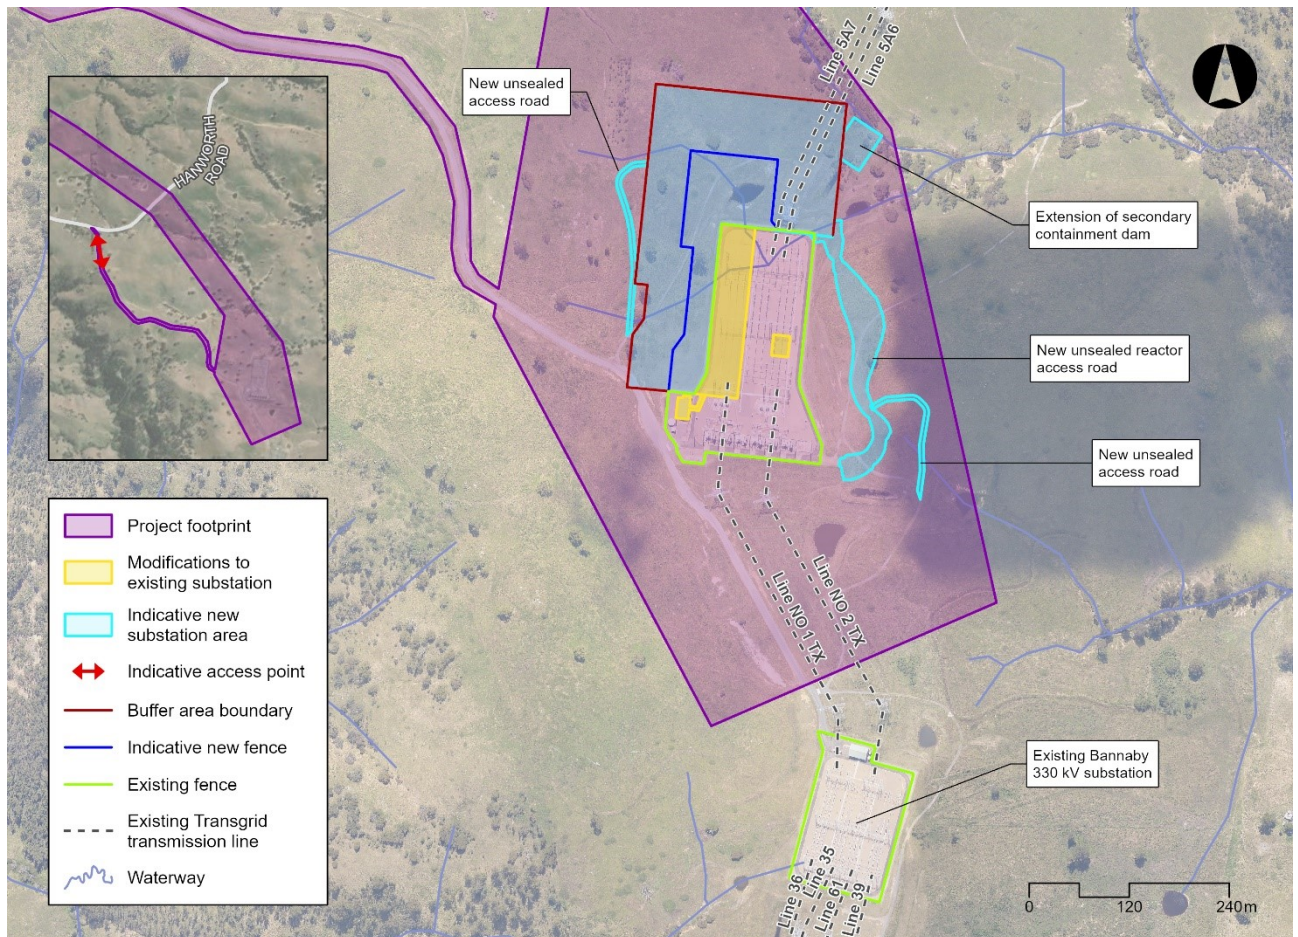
Indicative layout of the modified Bannaby 500 kV substation (subject to detailed design) showing location of the existing access road from Hanworth Road that would be upgraded as part of the project
